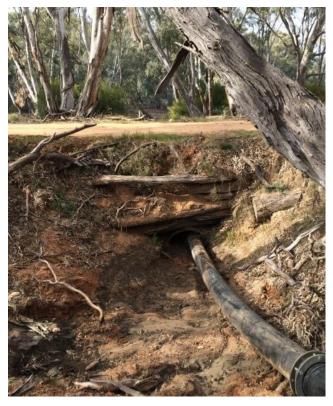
Pump Site C and Impediment Site 22. Pipe shown is for delivery of environmental water, delivered through the existing culvert.
